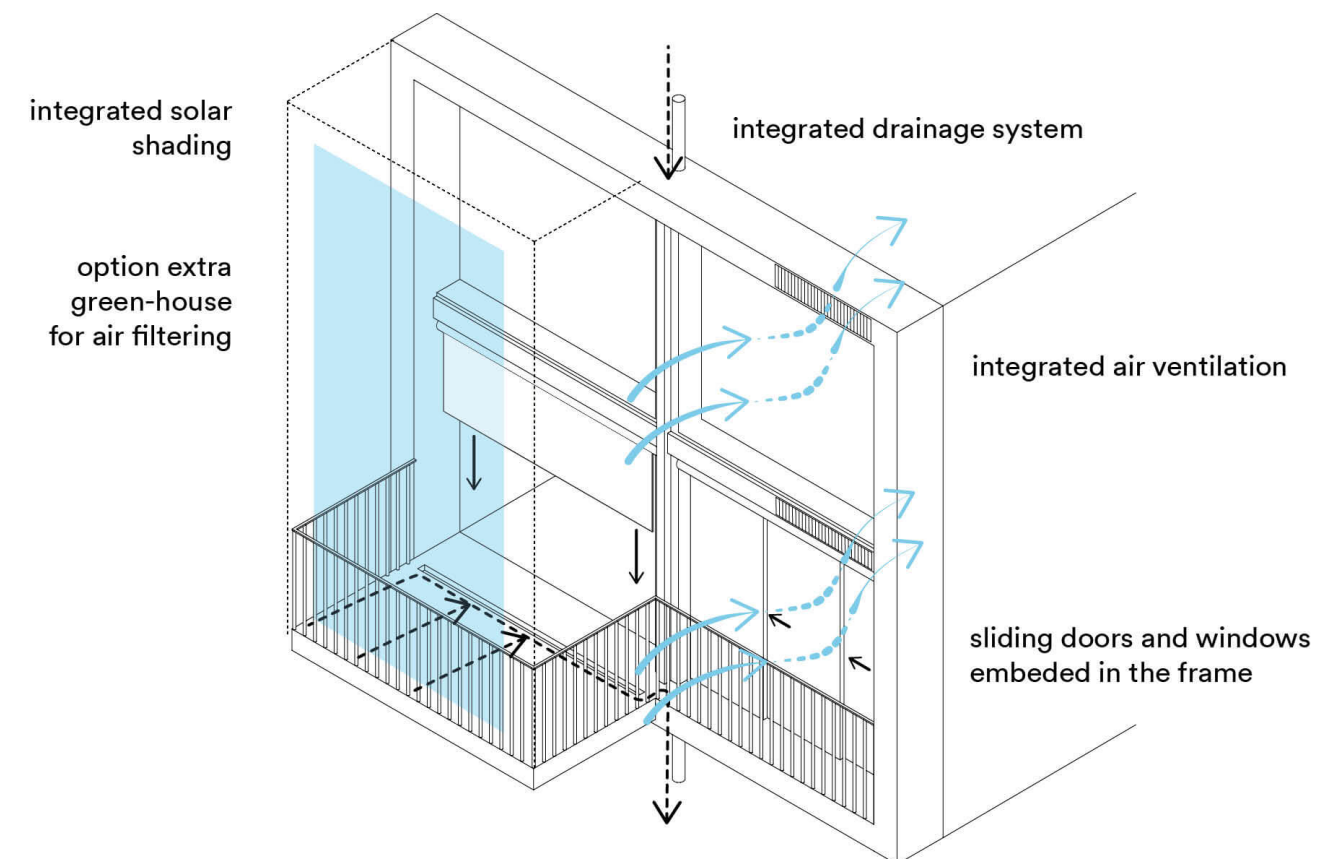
Prefabricated façade system. (Source: Marc Koehler Architects, n.d.)
